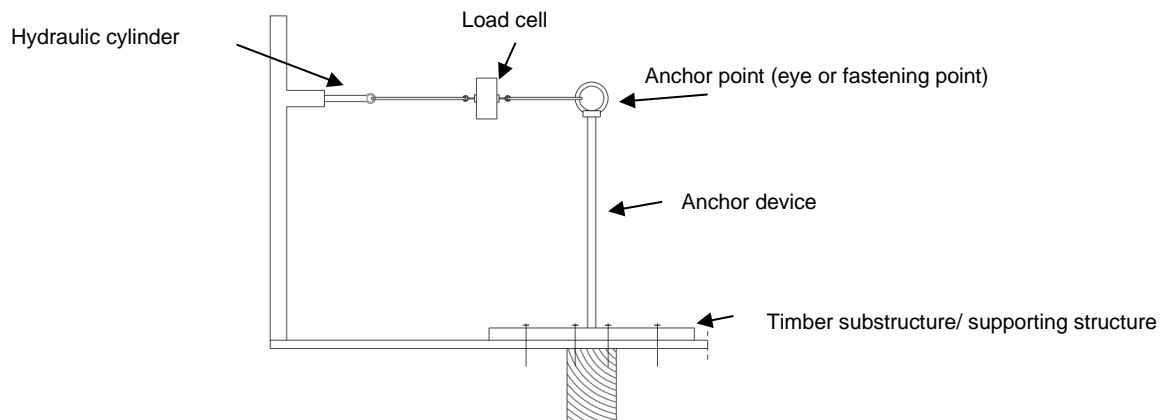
Example of a test arrangement of anchor devices for testing static loading – most unfavorable load direction: Perpendicular to the span (profile lines) of the timber substructure.
